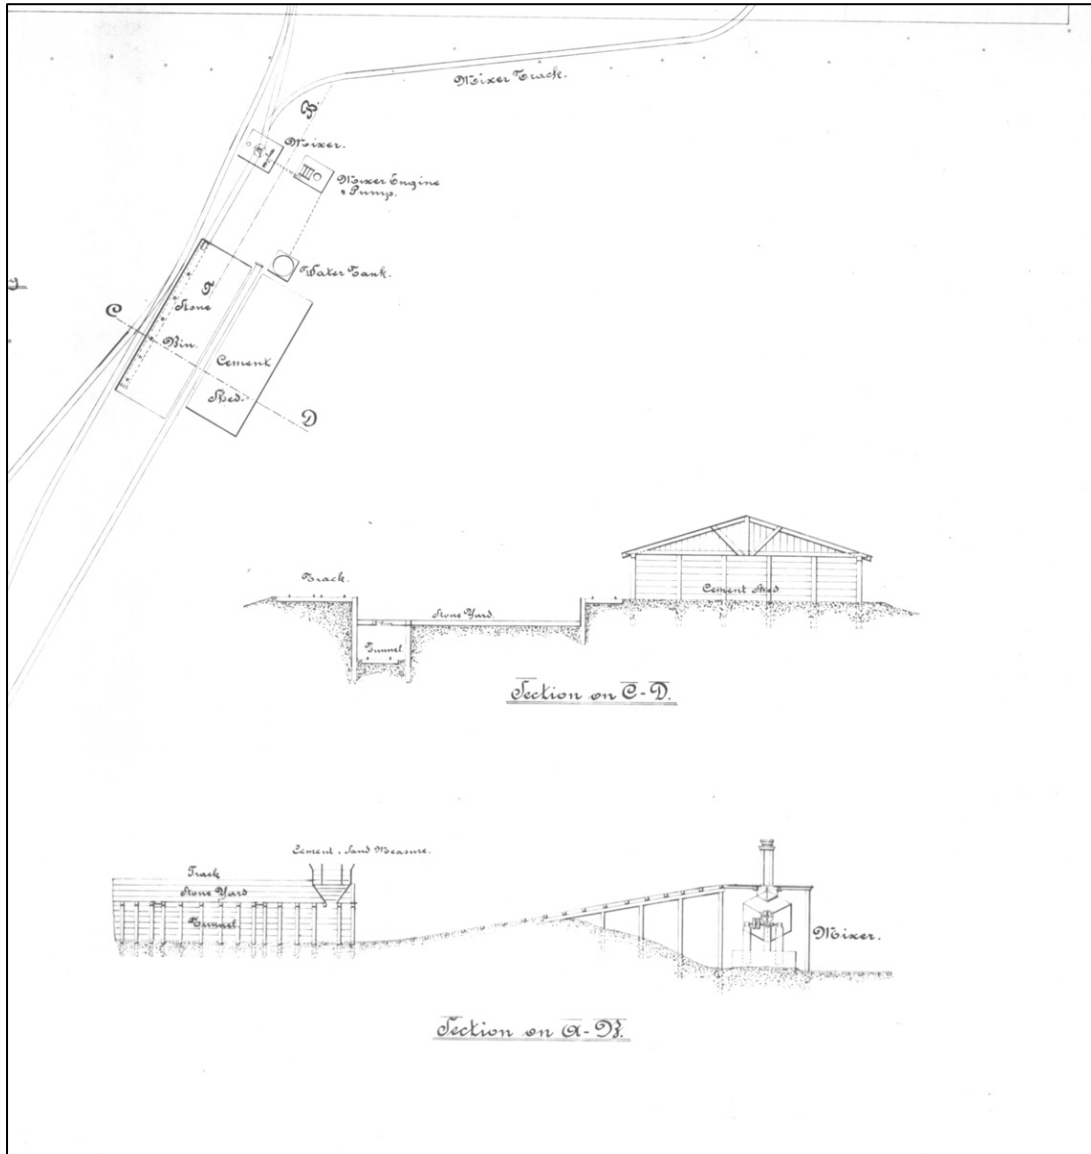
Detail of concrete plant from "Plans and Sections of a Half Sunk Mortar Battery near Sandy Hook Light, Sandy Hook, New Jersey, October 1890."
